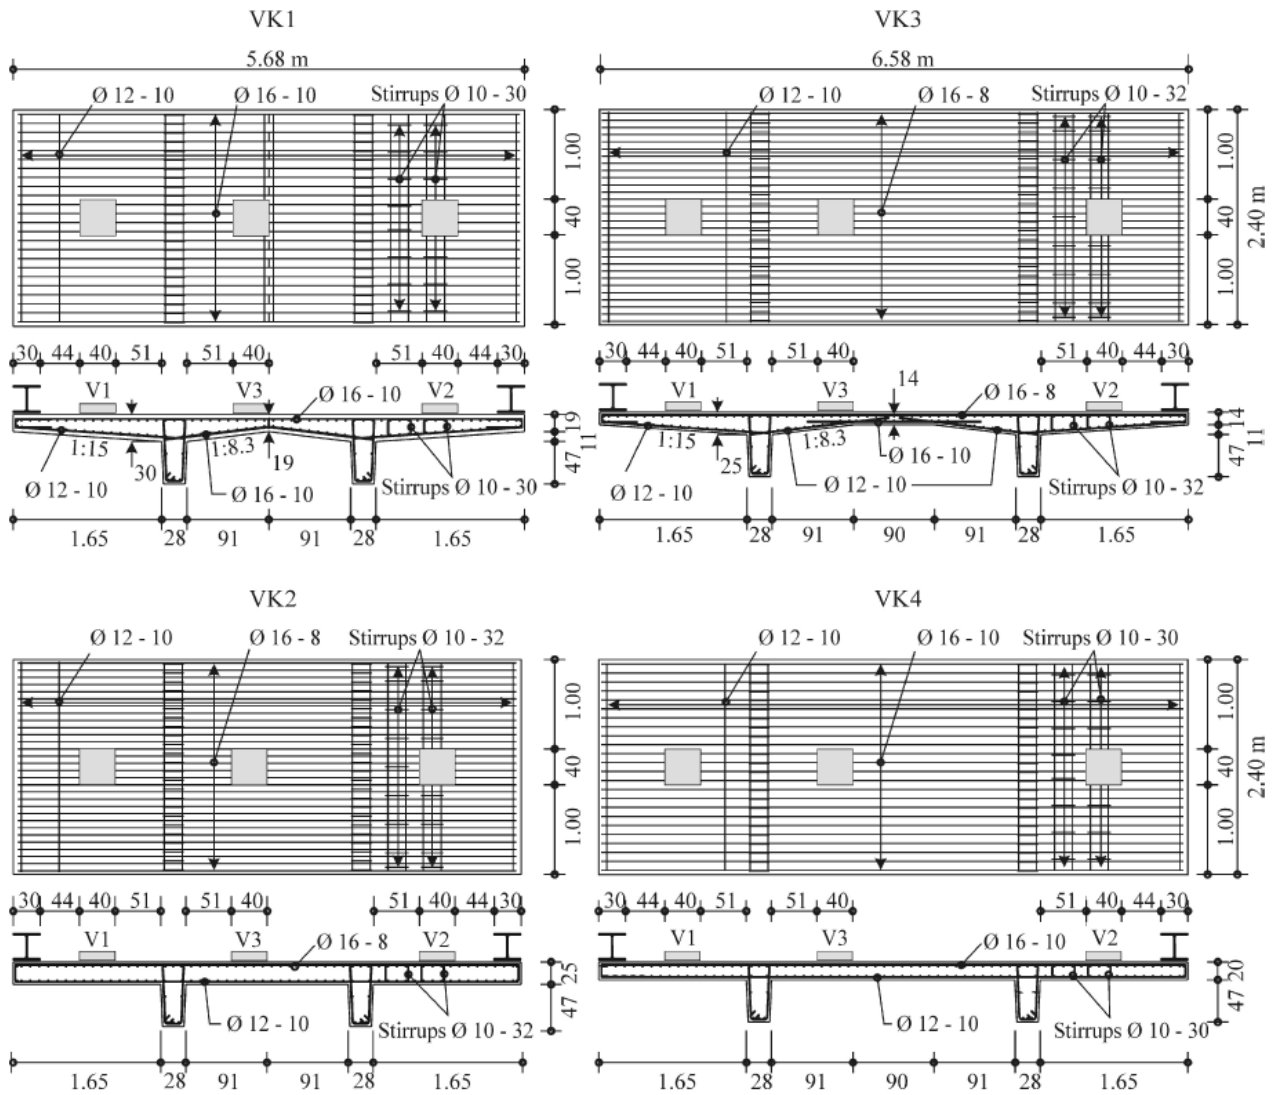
Dimensions and reinforcement layout of the test specimen VK1 to VK4 [Rombach and Latte, 2009].
